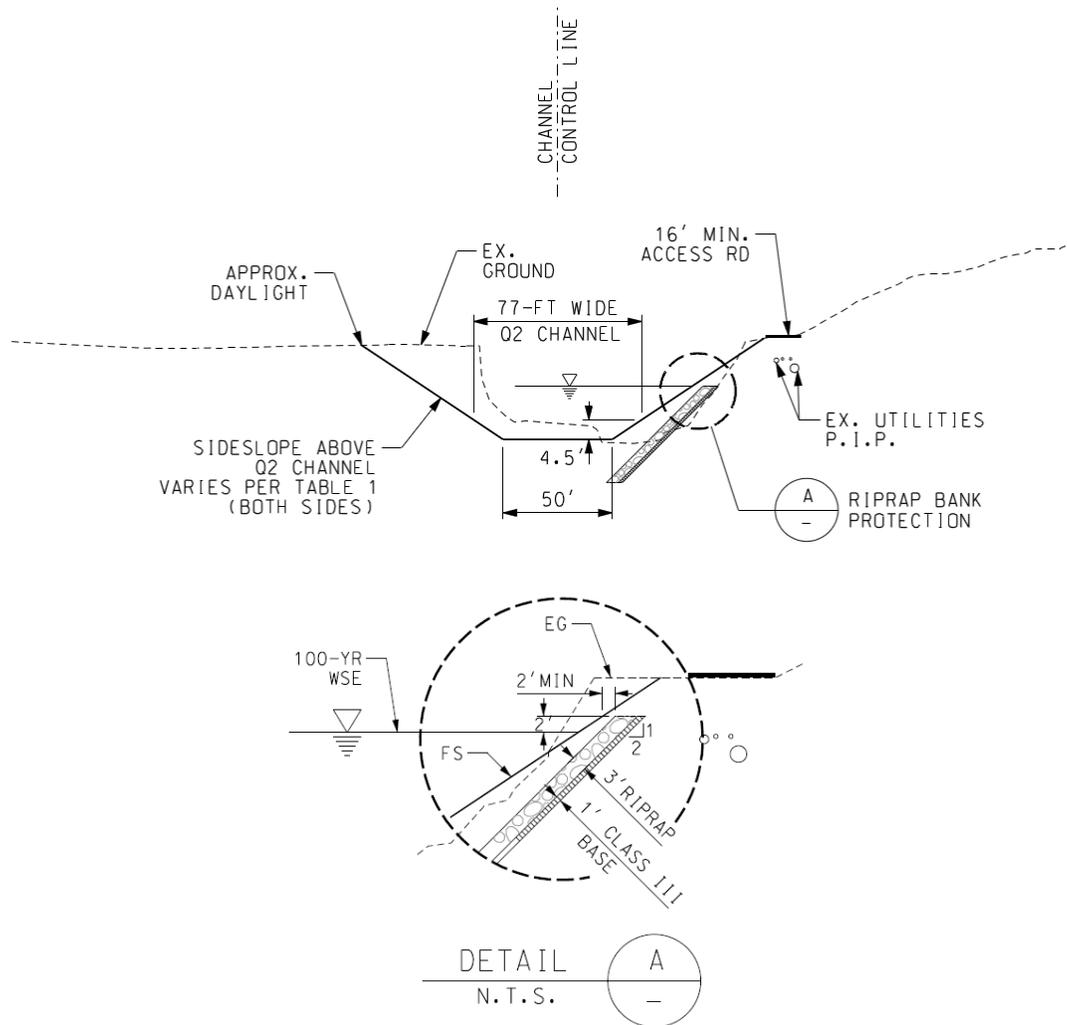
Typical Channel Design Section at Bends (Alternative 2)
